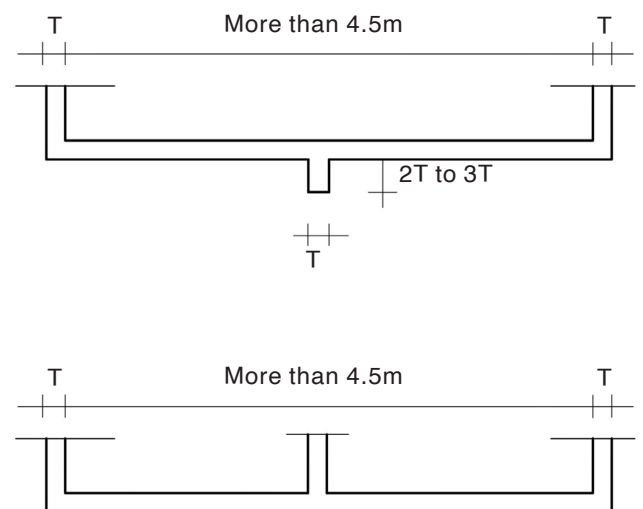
Butressing / Crosswalls needed for unreinforced masonry walls greater than 4.5m. <https://dev.earth-auroville.com/>
